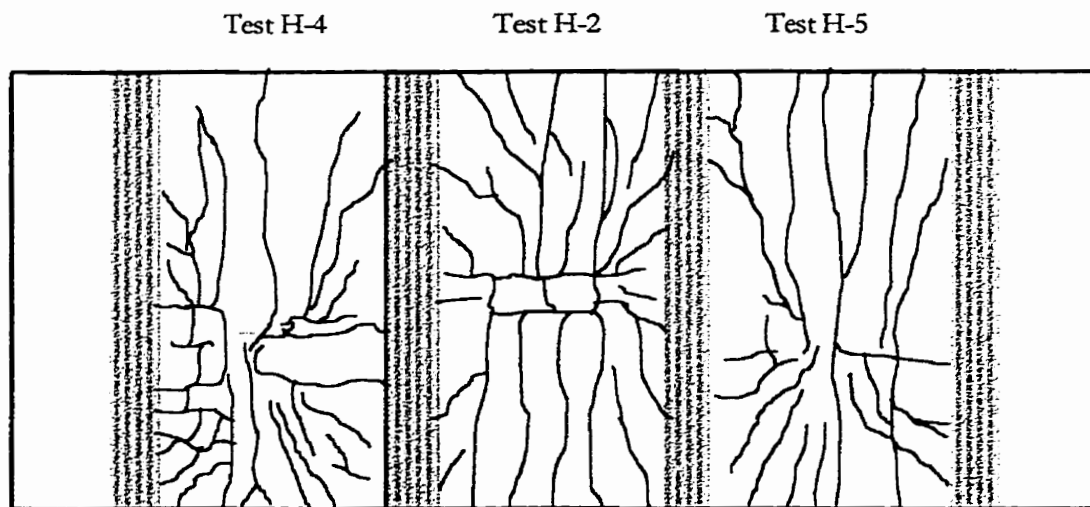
Cracks at 600 kN for Hybrid-Reinforced Slab
